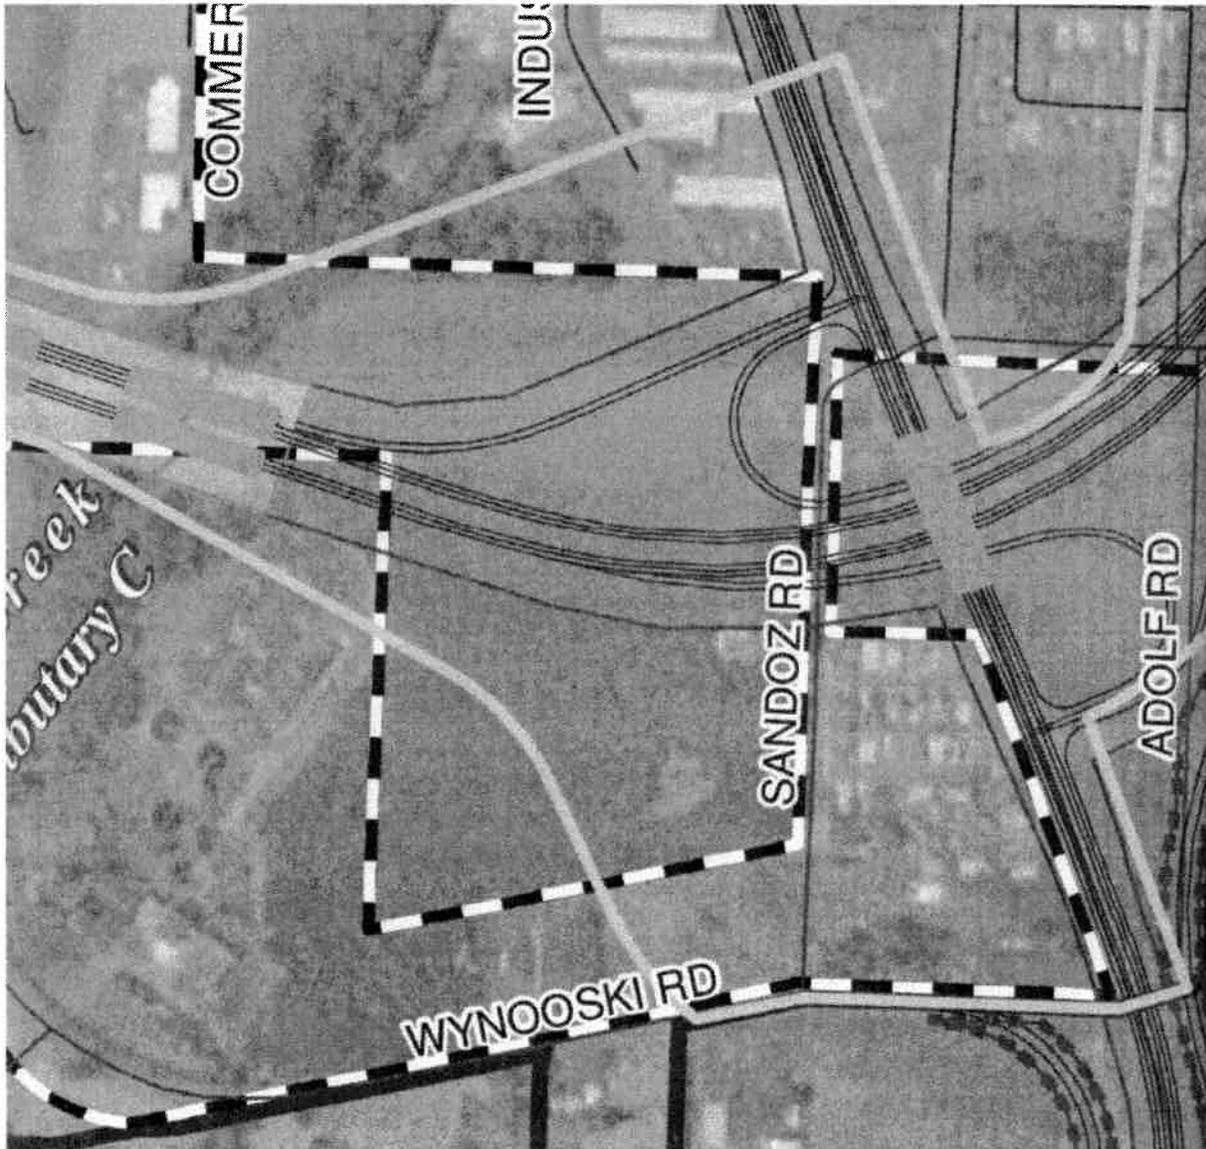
EXHIBIT I: LATEST ODOT BYPASS DESIGN (8/28/08)
